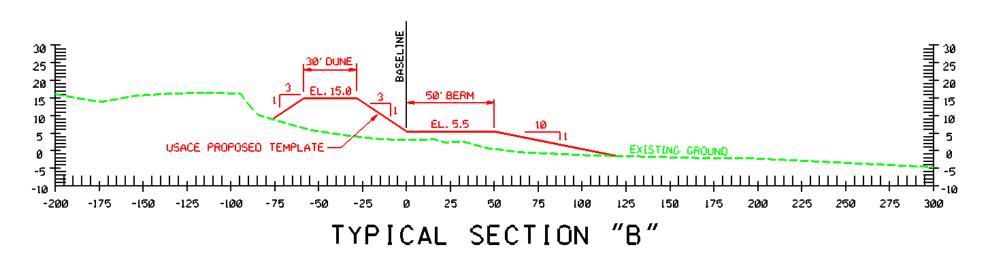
TYPICAL PROJECT SECTIONS TO BE CONSTRUCTED
